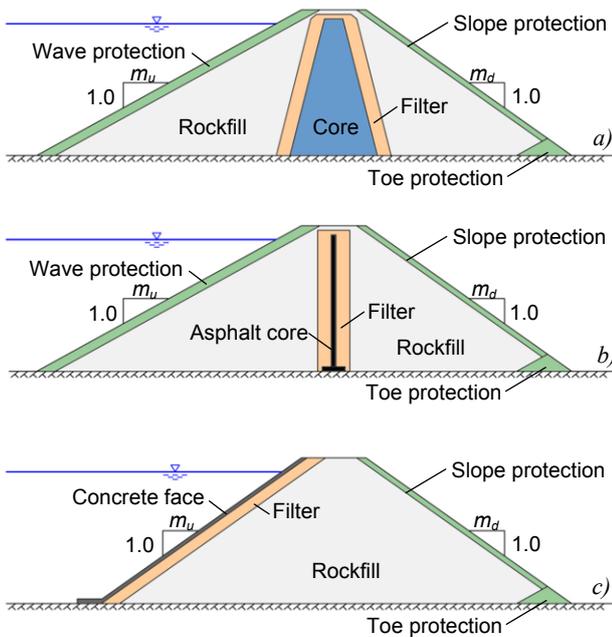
Typical cross sections for the proposed dams in the Lower Thjorsa River. *a)* Rockfill dam with a central core of loessoidal soil. *b)* Rockfill dam with a central core of asphaltic concrete. *c)* Rockfill dam with an upstream concrete face.
